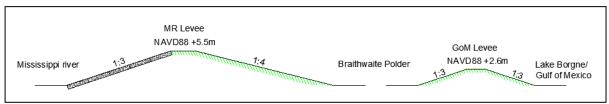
Schematic cross-section of the levees surrounding the polder (Not in scale in longitudinal direction)
